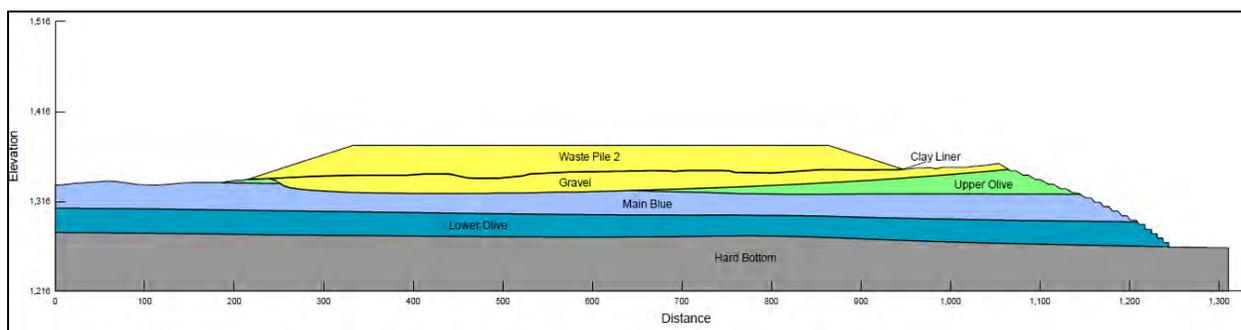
WRSF 2 Stability Cross-section (Source: GRE, 2023)
